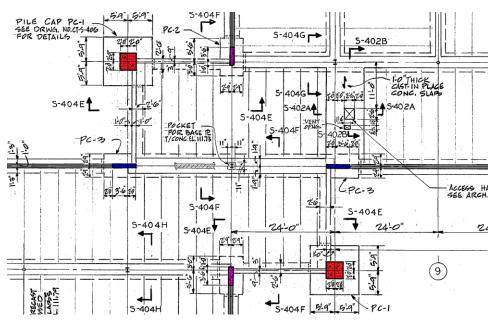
The Pop-Up Structure Connection to the Admin and Lab Buildings
